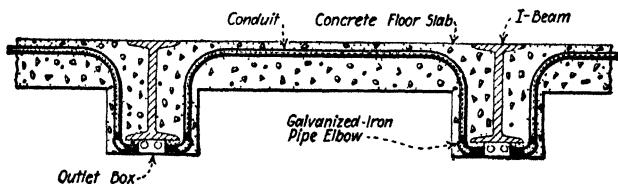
Pipe elbows used under an I-beam where space is restricted.
